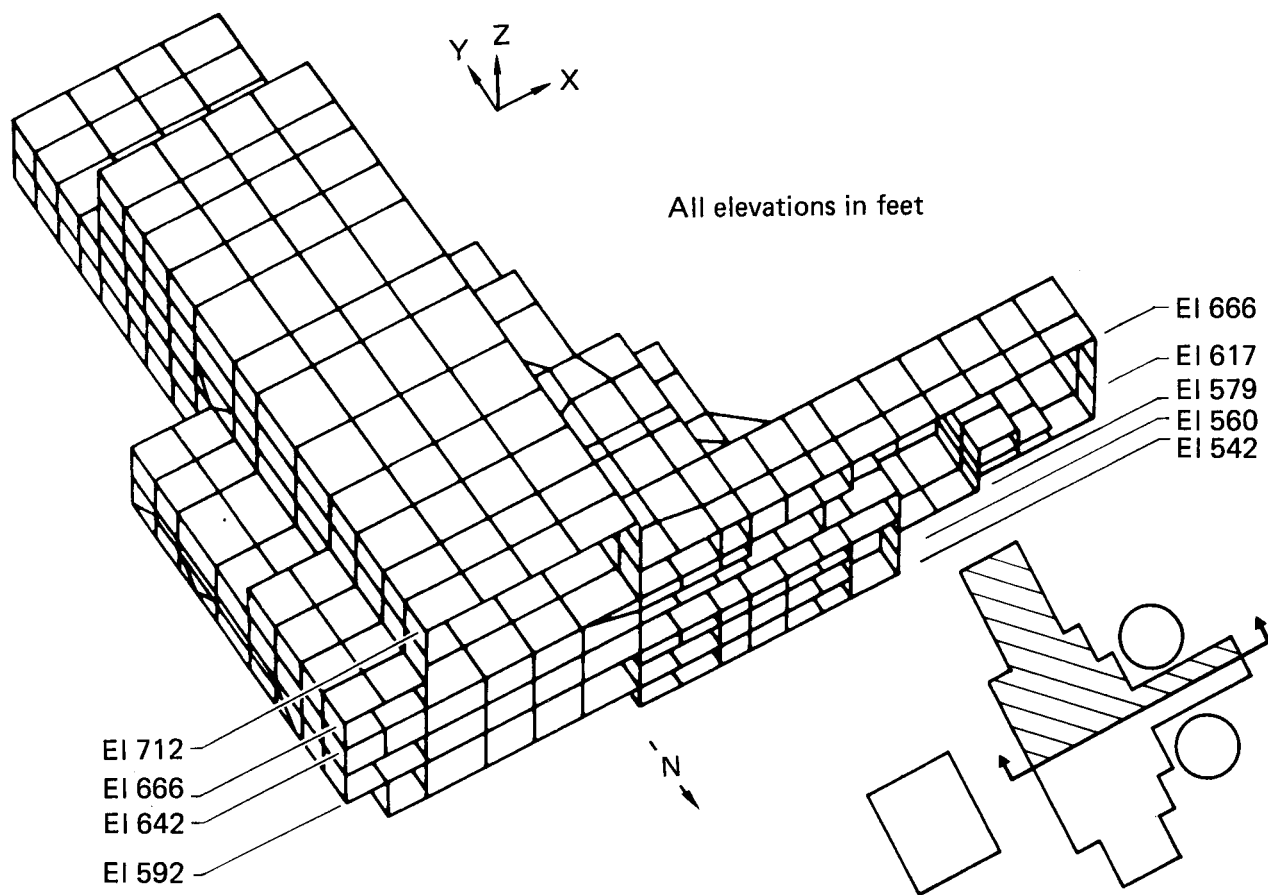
Finite element half-structure model of the AFT complex; shaded area of the inset sketch shows the portion of the structure modeled.
